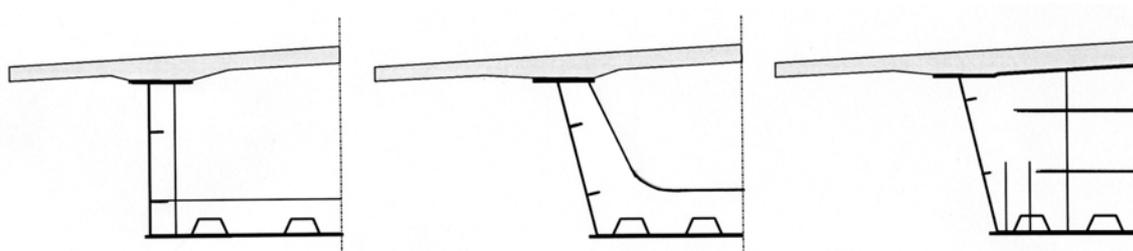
Transverse elements: transverse frames at left and centre; bulkhead over support at right
